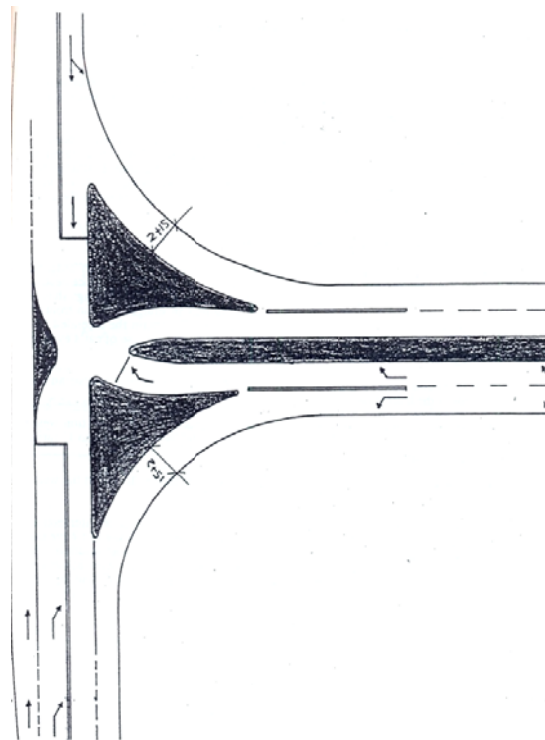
9 Intersection Jinnah Avenue//F/G8 Service Road West
